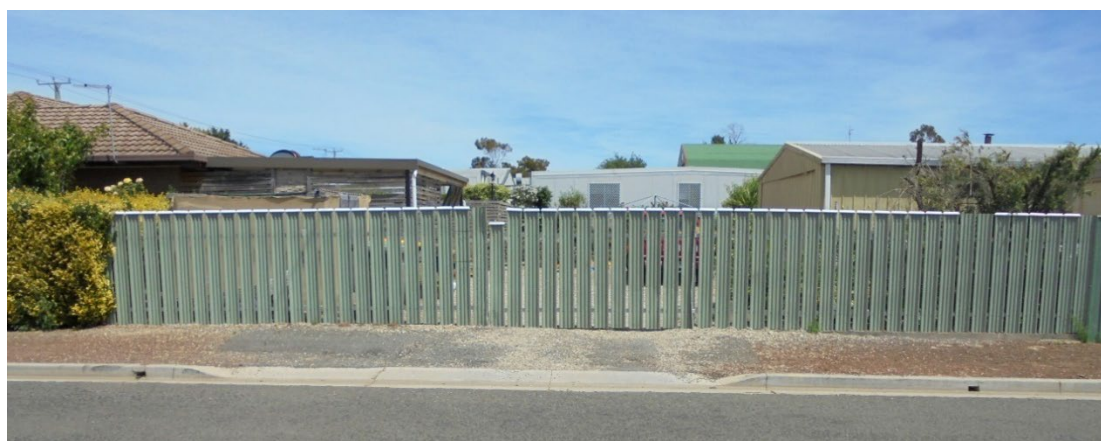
boundary with 28 King Street and crossover to be reinstated to kerb and channel
